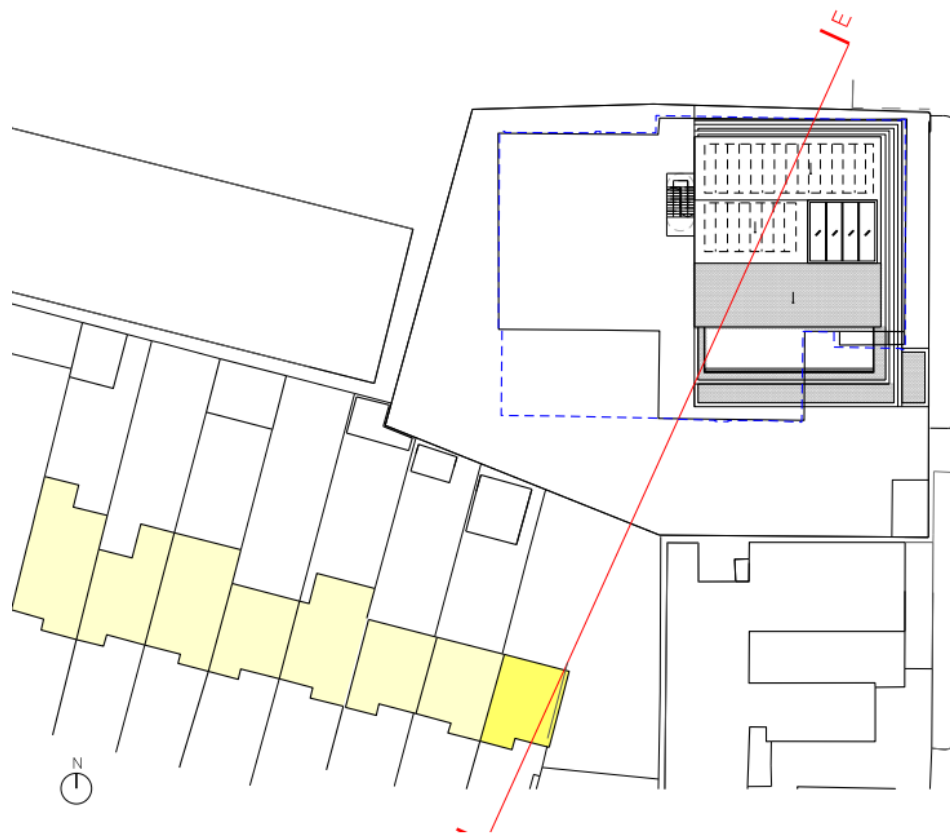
Site plan showing location of nearest residential buildings (yellow)
